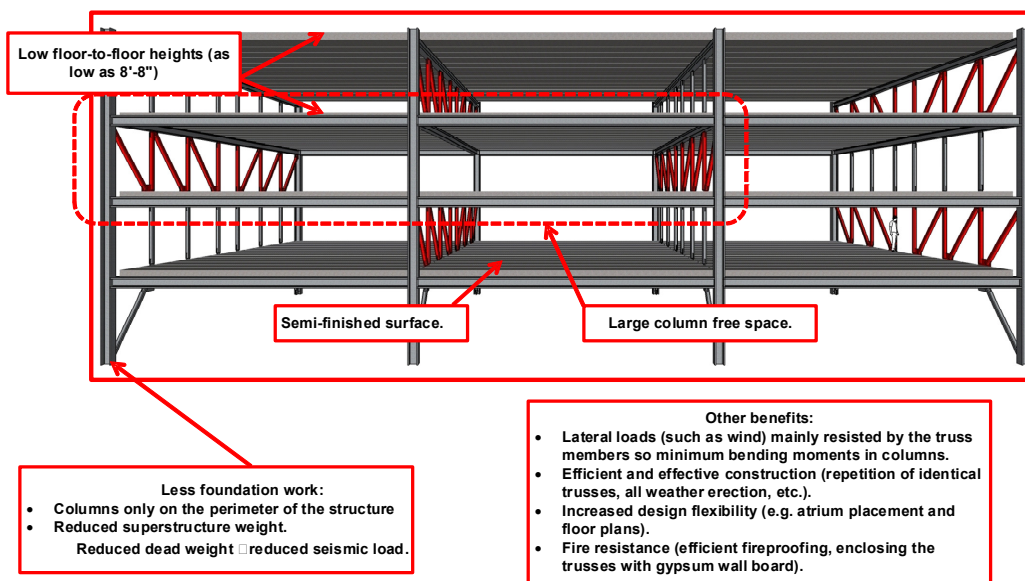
Advantages of Steel Staggered Truss Frame System (STF system).
